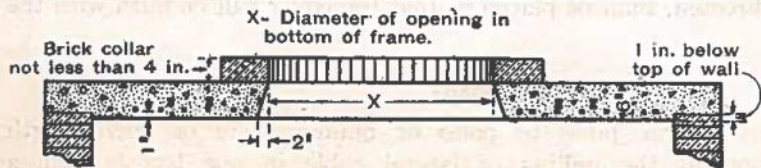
Manhole Roof of Concrete Reinforced with Rods
